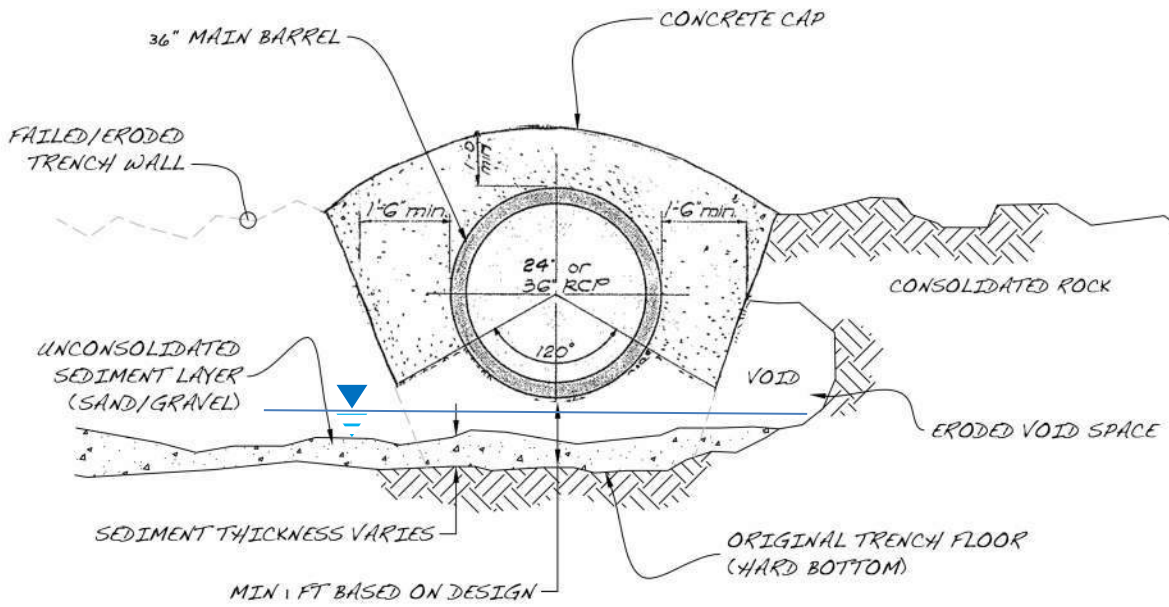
Typical section of unsupported span of 36-inch main barrel, looking offshore near waterline
